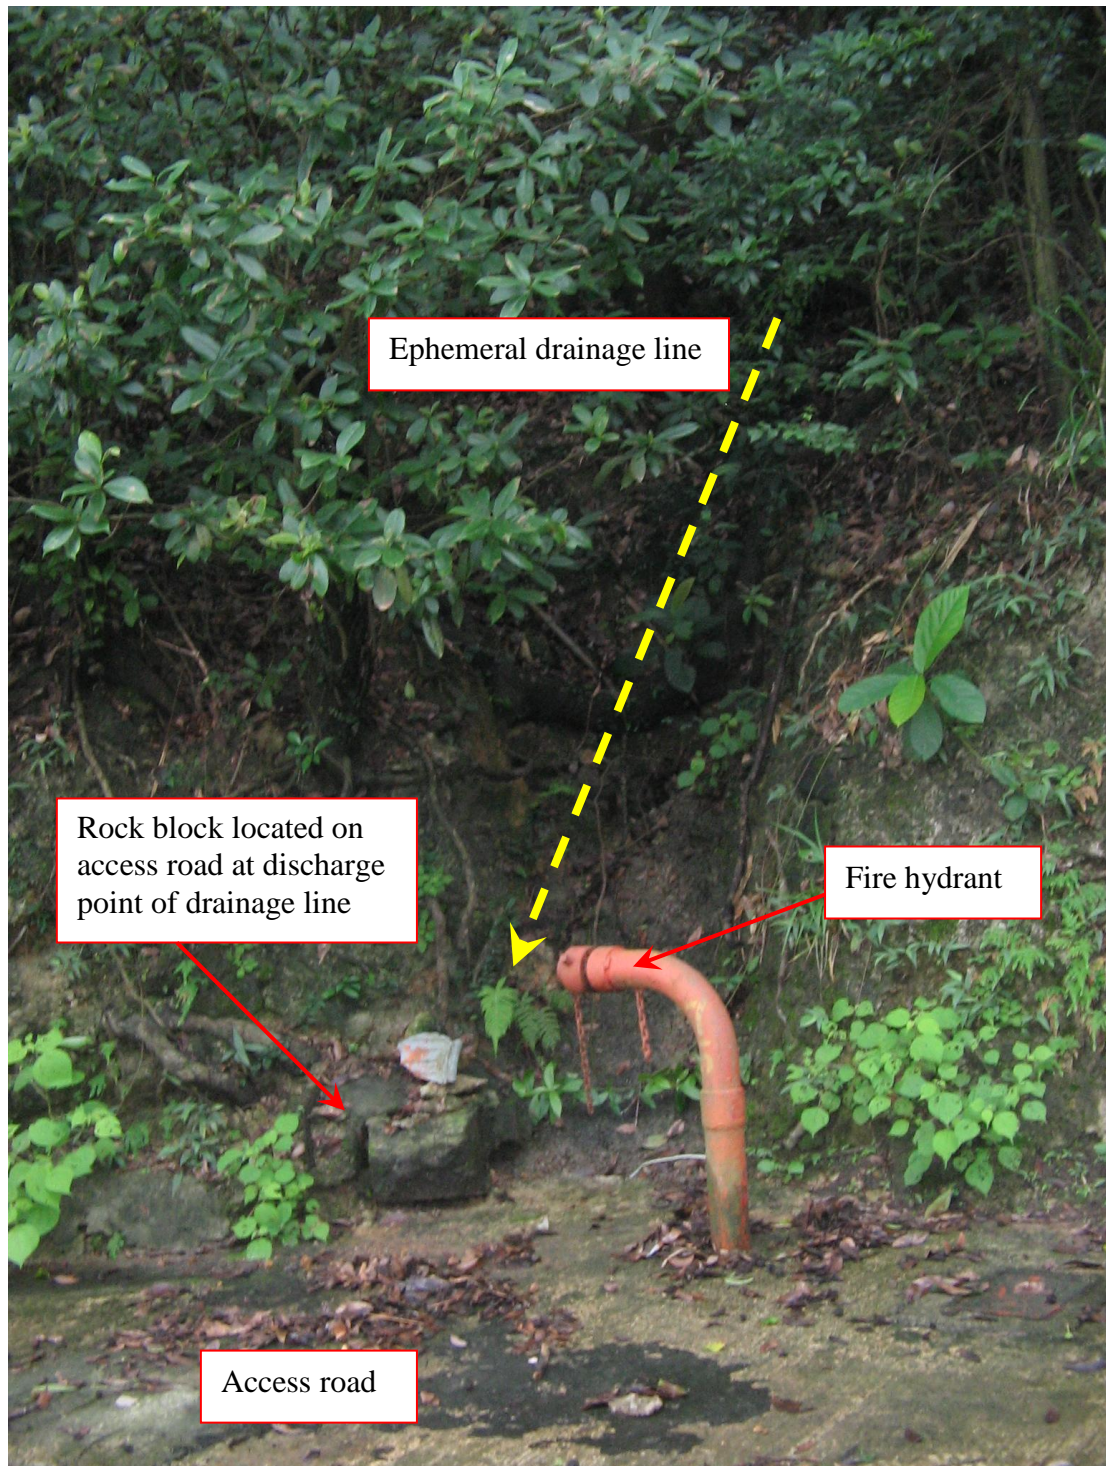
Ephemeral Drainage Line which Discharges Directly onto the Access Road (Photograph taken on 11 June 2007)
